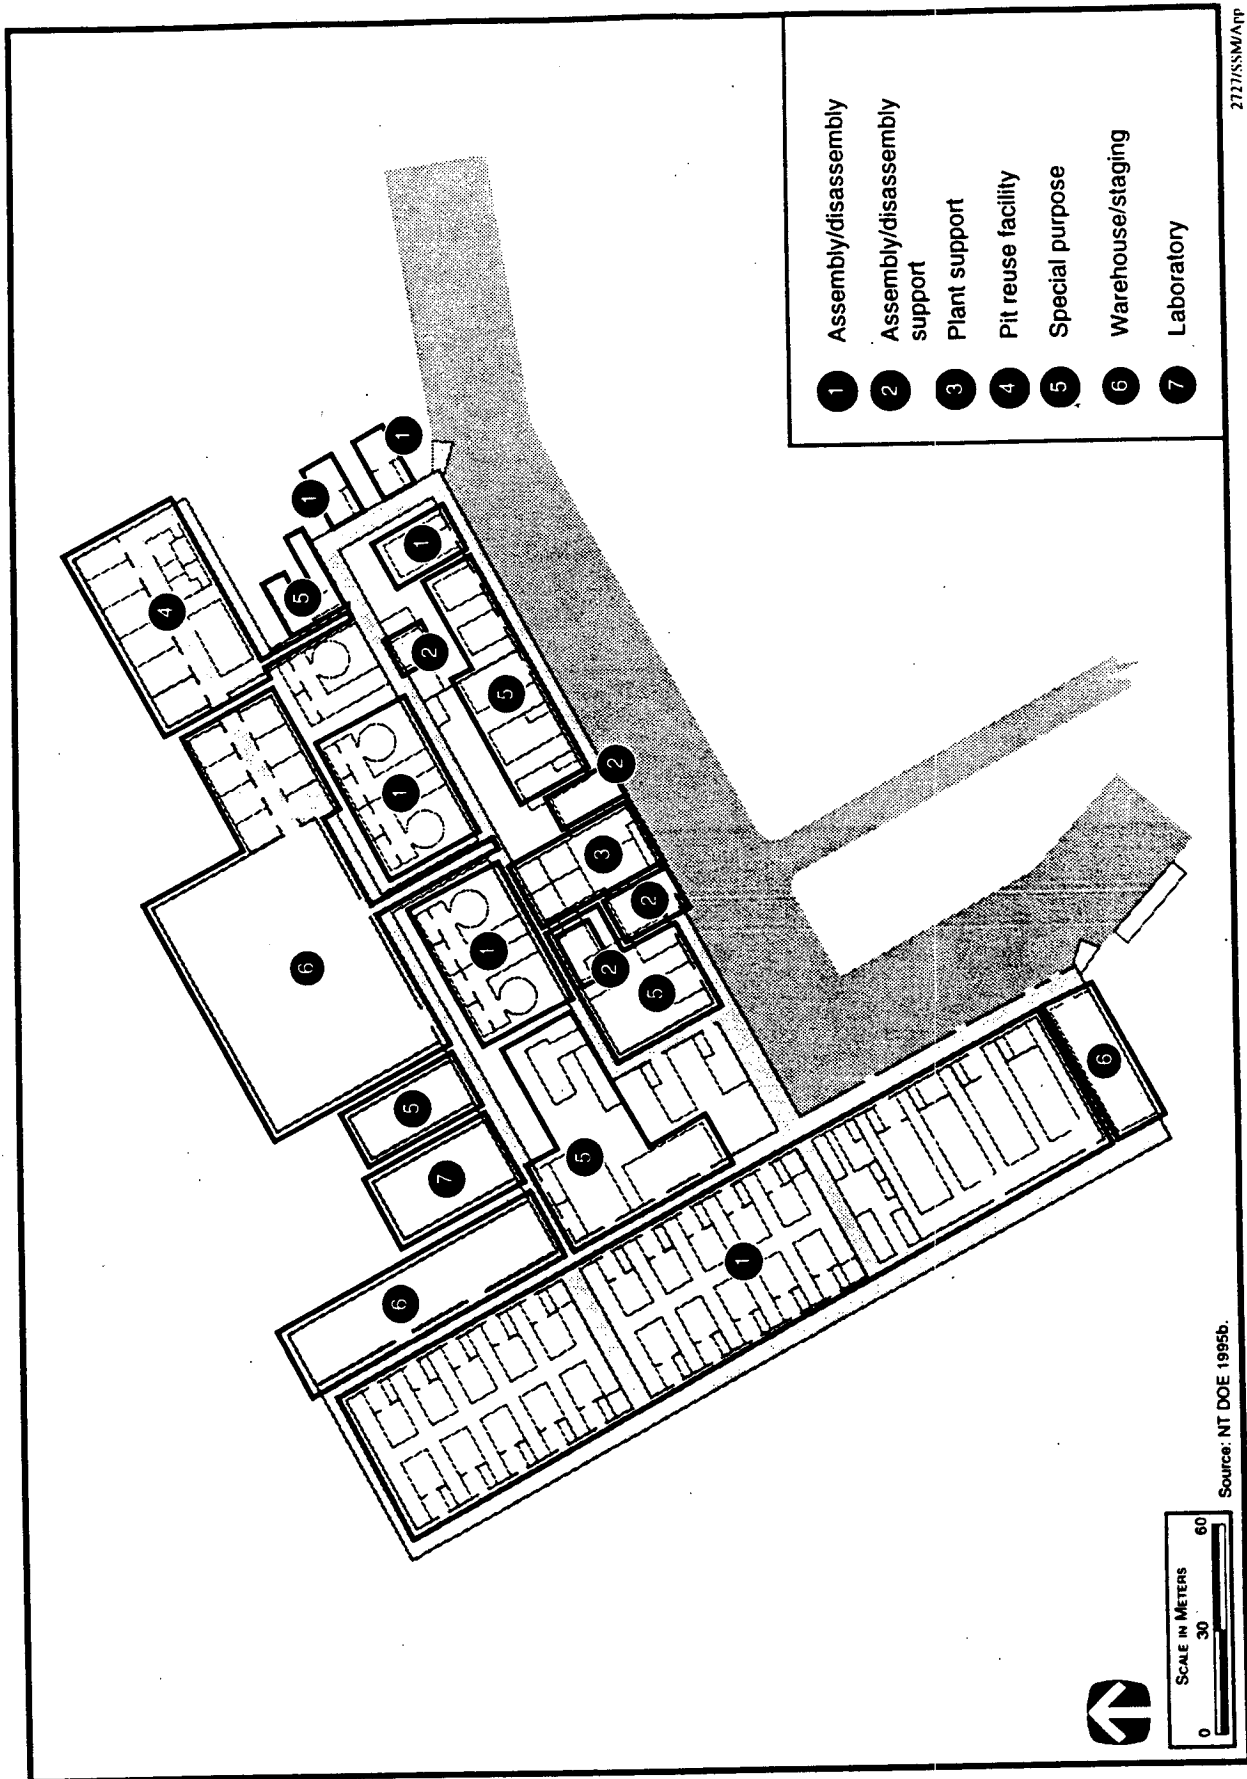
Weapons Assembly/Disassembly Site Plan (Expanded View) for Nevada Test Site.
